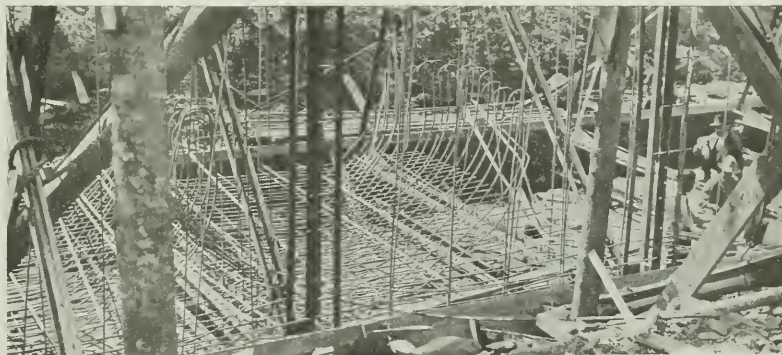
Reinforcing Steel at the Base of One of the Counterforts—West Side Entrance Wall, Port Weller.
